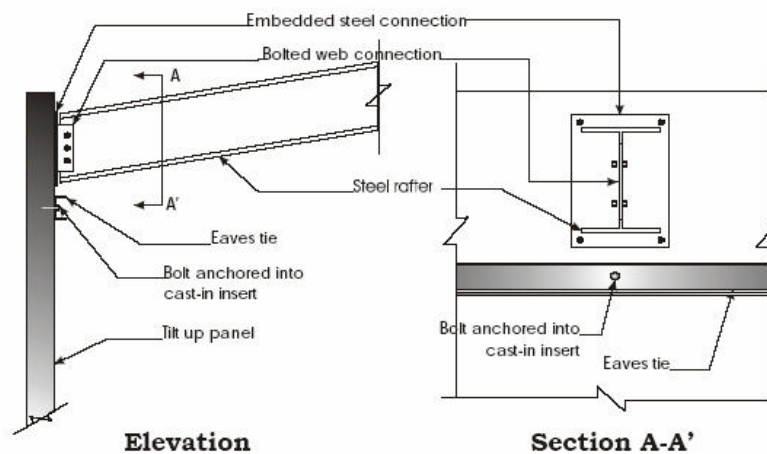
Typical steel rafter to concrete panel connection (Lim, 2000)
